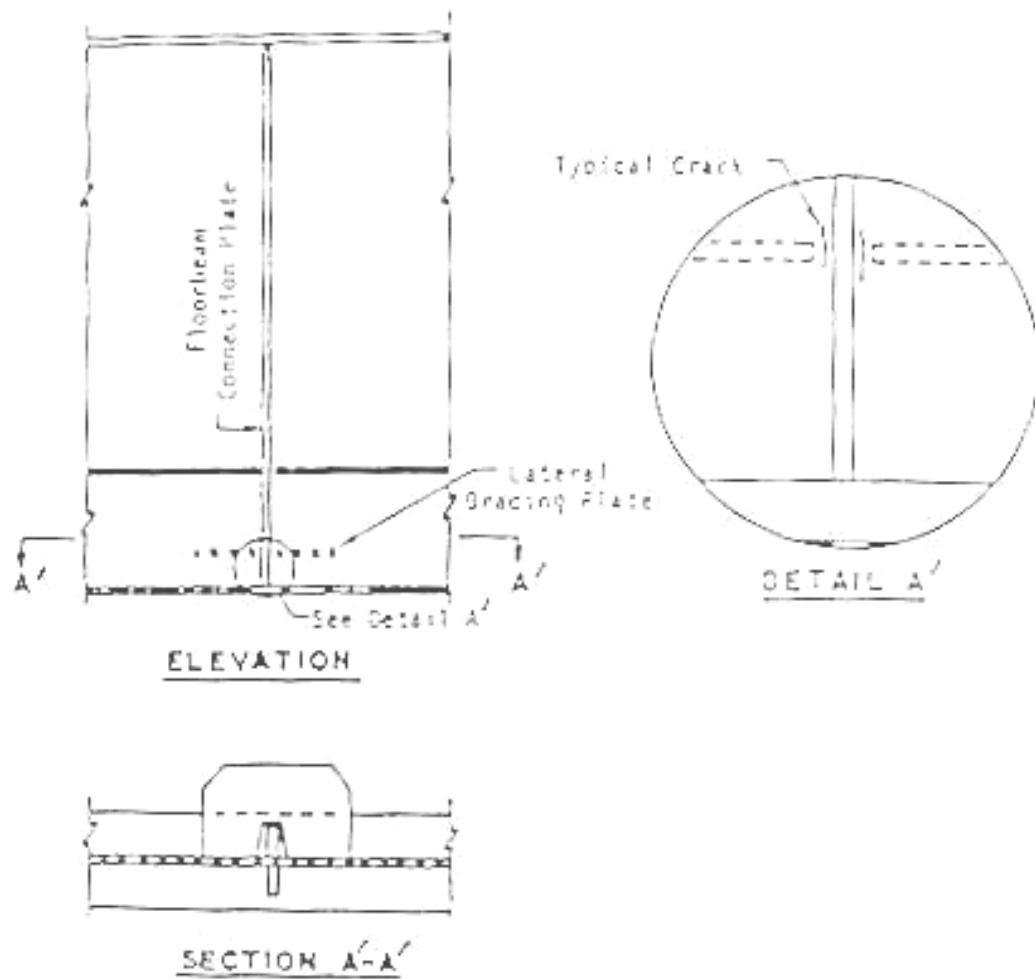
Floorbeam and lateral cross bracing connections in the Big Sandy Creek Bridge (Demers and Fisher, 1990)
